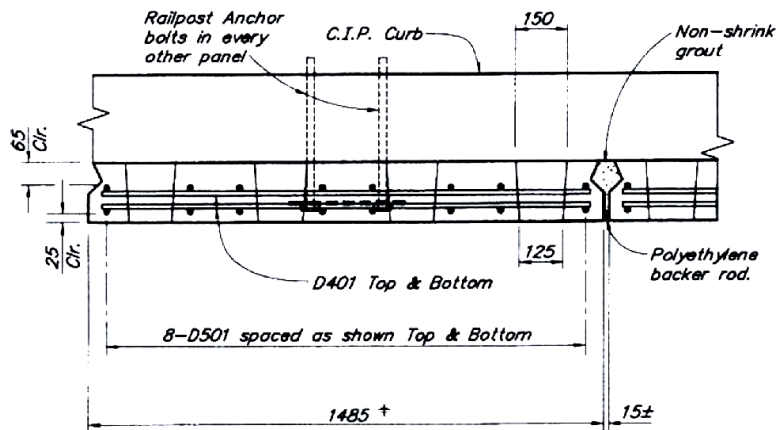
Transverse Joint Detailing for Precast Deck Panel Bridges in Alaska (Badie and Tadros, 2008)
